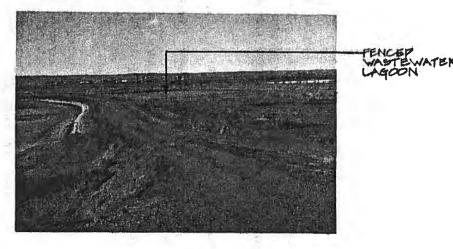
DOMESTIC WASTEWATER SYSTEM - LIFT STATION AND LAGOON
